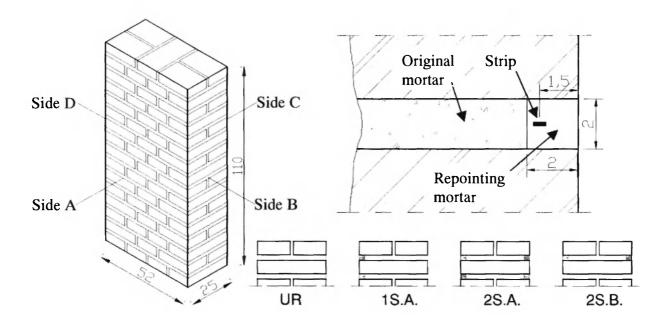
Specimen dimensions (units are in cm). Detail of the reinforced bed joint. Reinforcement configurations.
